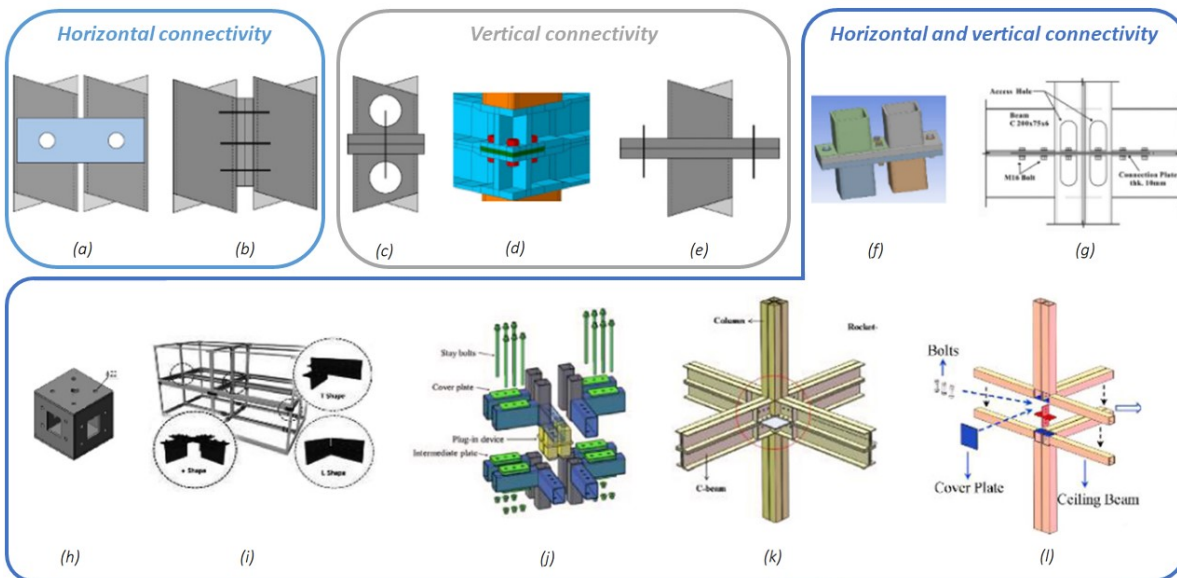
Existing inter-modular steel connections, (a) Tie plate; (b) Bolted side plate; (c) Bolted end plate; (d) Bolted connection; (e) Bolted end plate 2; (f) Bolted end plate (complex); (g) Bolted connection plate; (h) Steel bracket; (i) Steel bracket 2; (j) Bolted connections with plug-in device; (k) Bolted connection with rocket-shaped tenon; (l) Bolted connection with welded cover plate, from [55]
